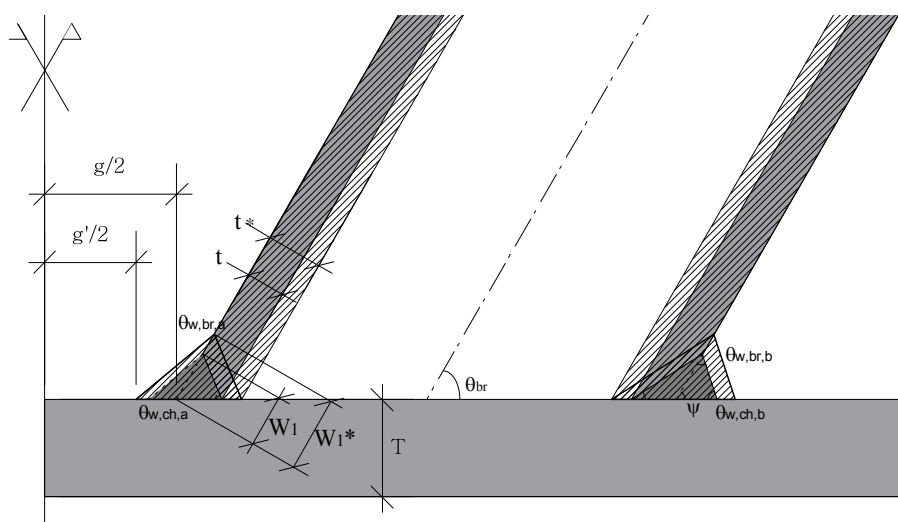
Side view of the diagonal to chord wall joint, definition of weld size.
